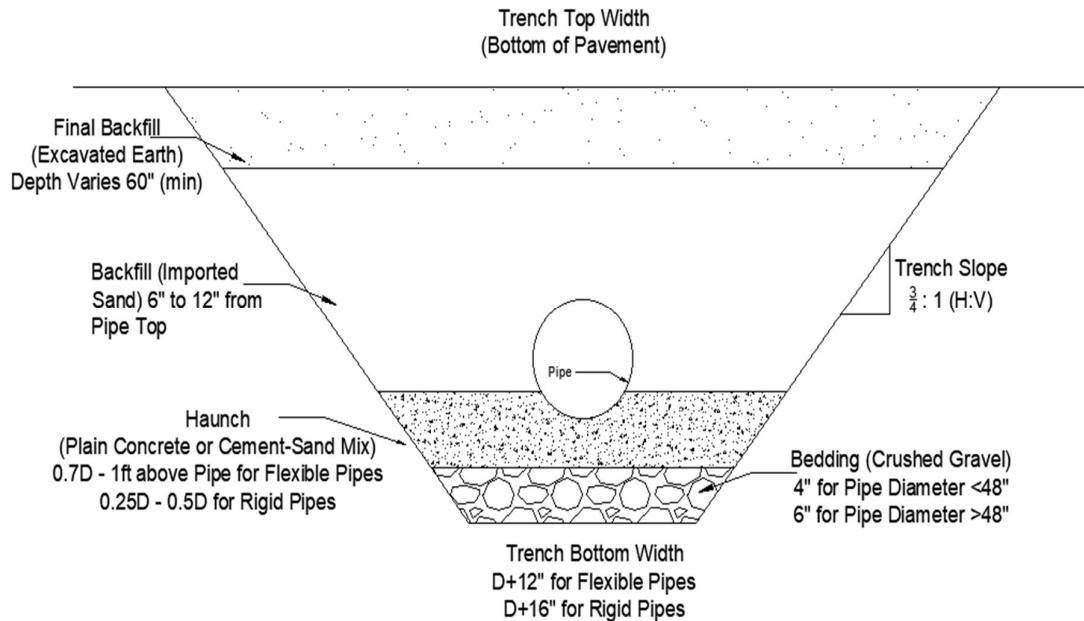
Single pipe flat trench cross-section (drawn not to scale)
